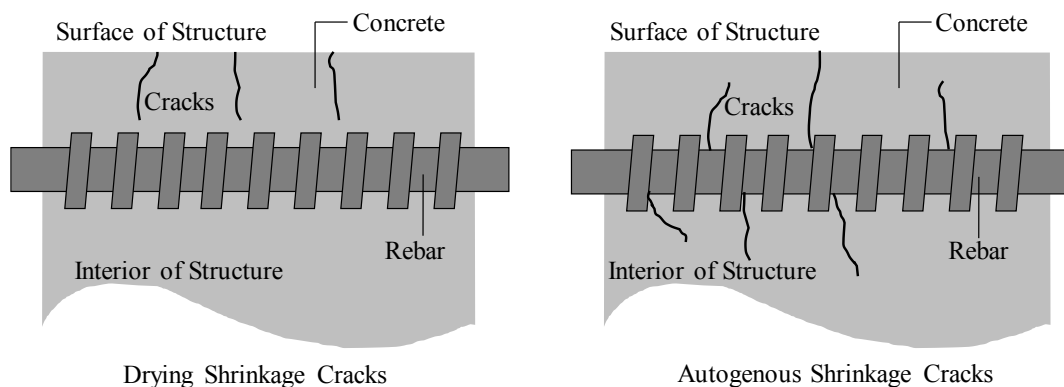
Image Figure of Cracks due to Shrinkage of Concrete ^[6]
